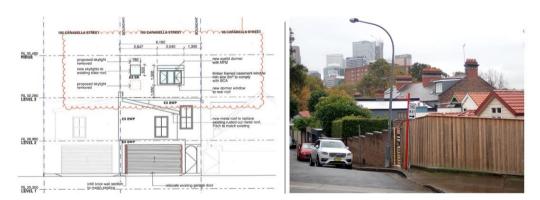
The approved dormer at 100 Carabella Street (right) as seen from Crescent Place
